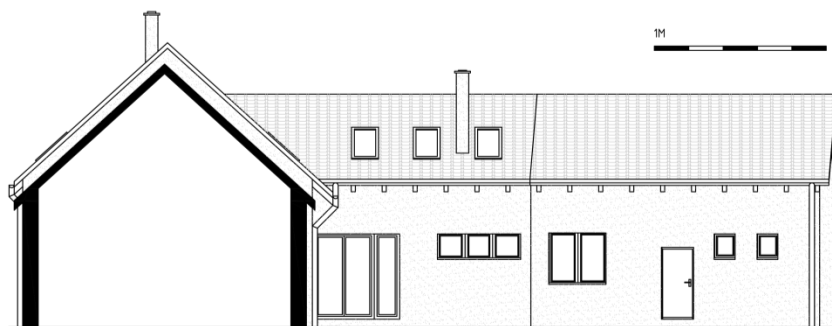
Southern elevation of the hypothetical reconstruction of single-family house in Přebice. Black hatching indicates neighbouring building.
